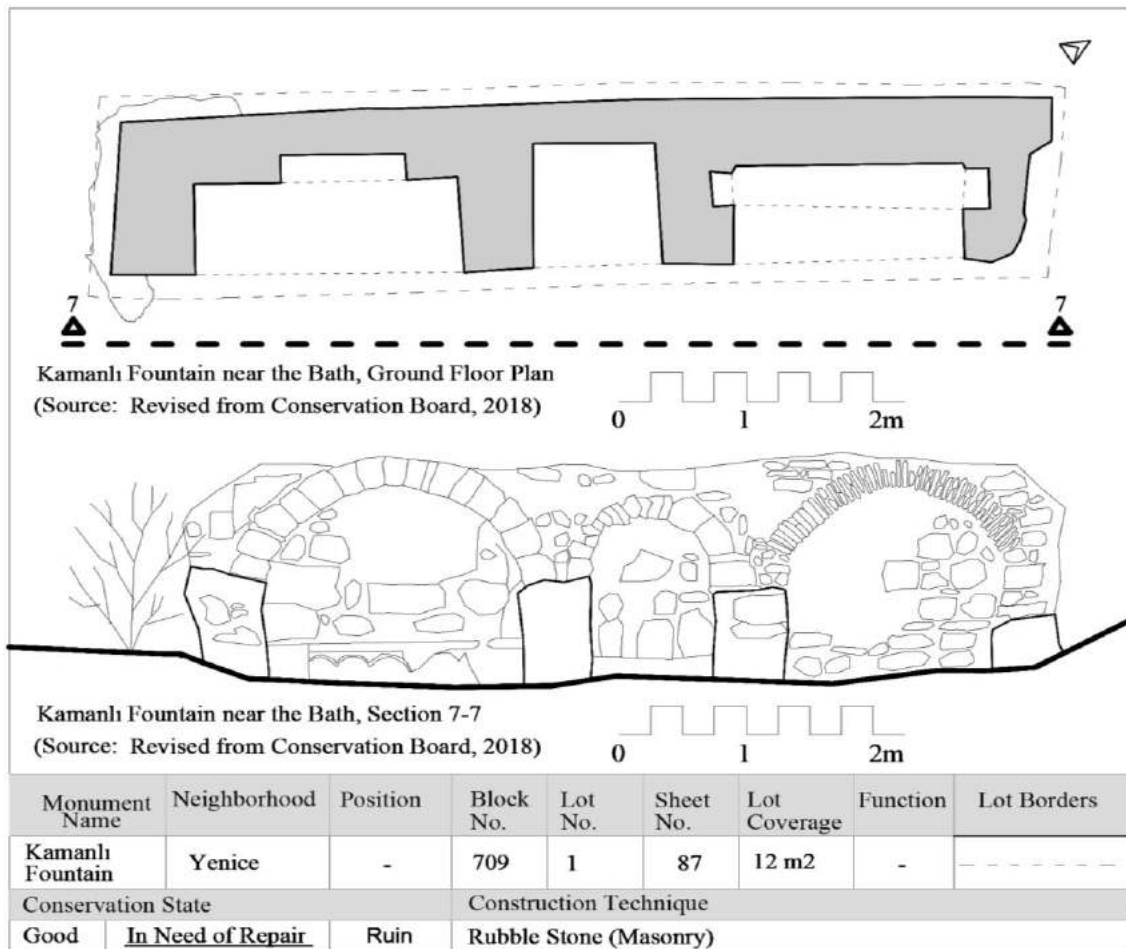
Ground floor plan and section, Kamanlı Bath Fountain
